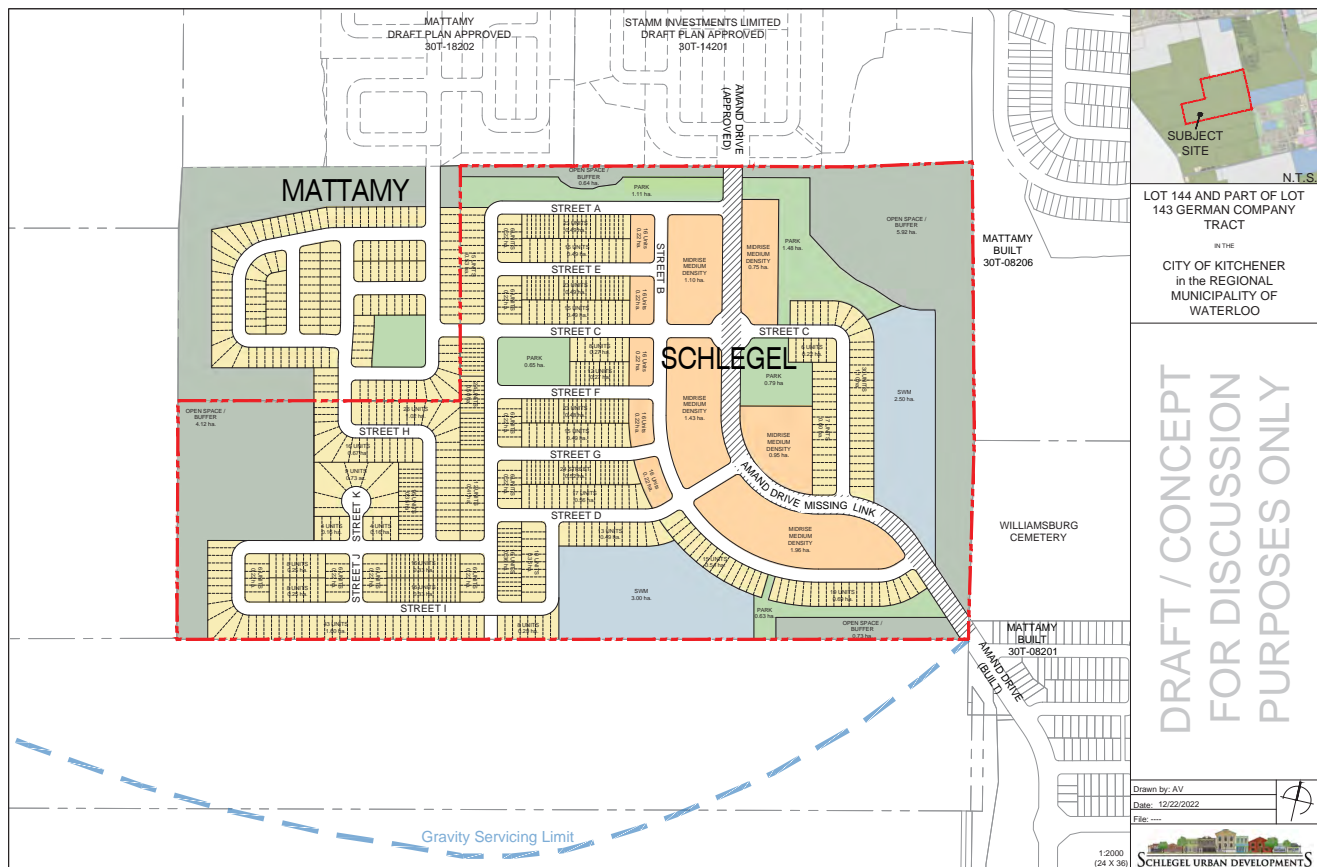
BSF2 Lands - Proposed Concept Plan with adjacent Mattamy Lands highlighting the completion of Amand Drive in southwest Kitchener.
